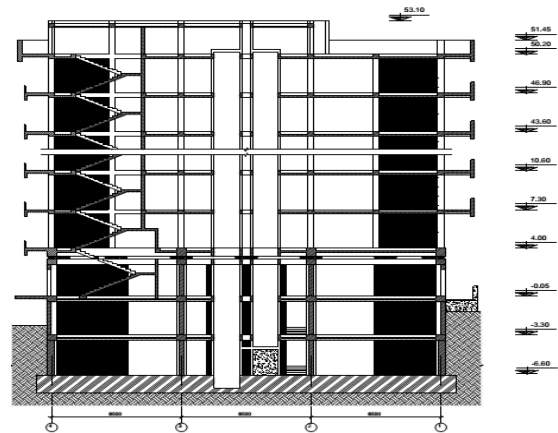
Vertical elevation of the 17-story base isolated apartment building “Sevak” in the direction along the letters axes (between the axes “B” and “C”)
